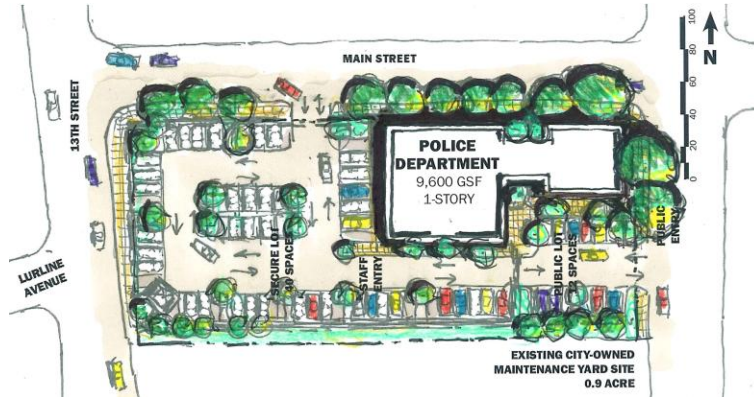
Facility Plan Detail: Police HQ at former Maint. Yard
